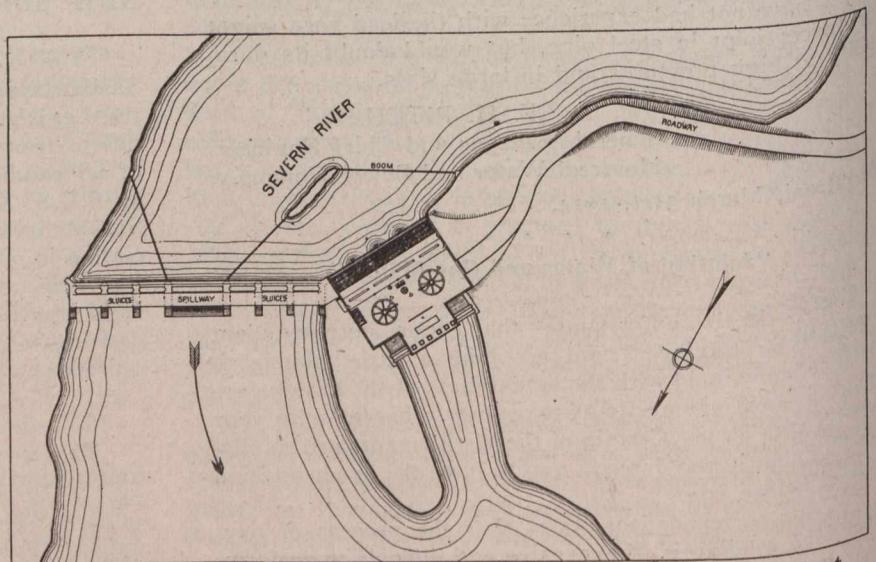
General Arrangement of Wasdell's Falls Power Plant.
